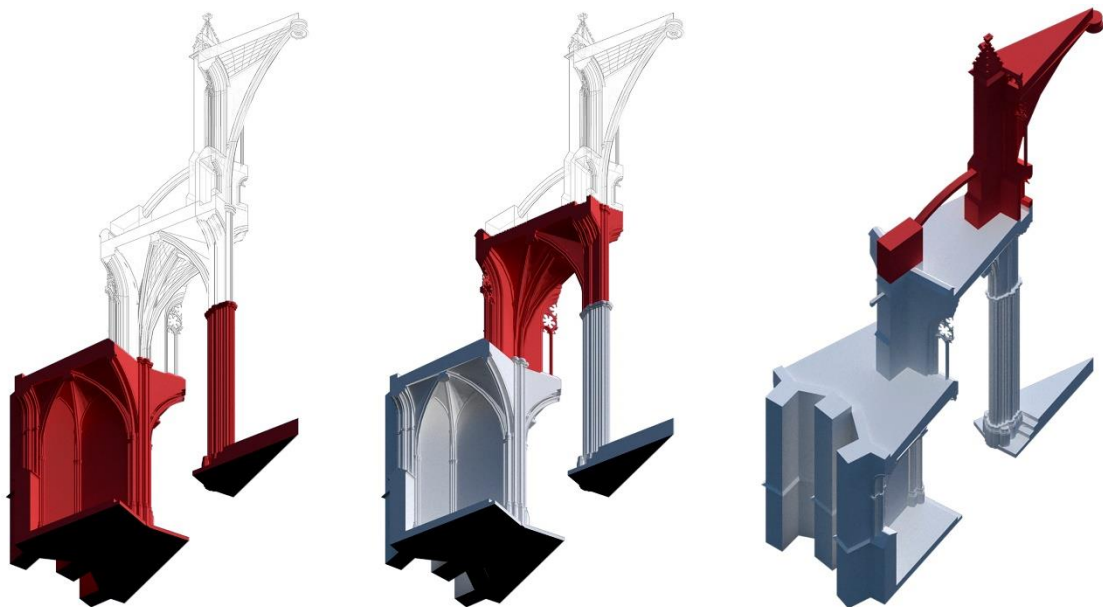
Hypothesis on the building stages and loading of architectural elements. On the left, first building stage; in the centre, second building stage; and on the right, third building stage.
